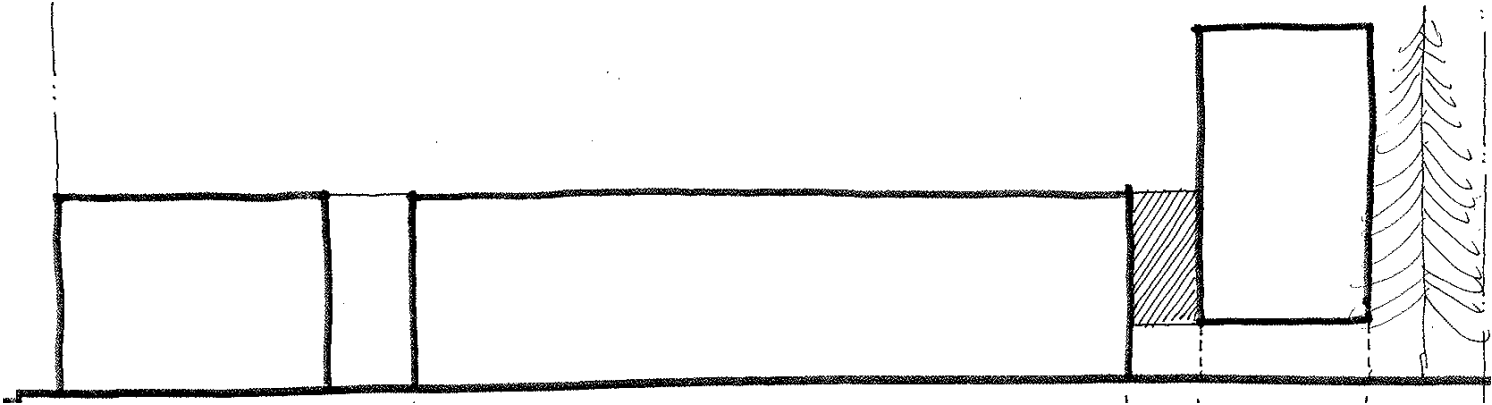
Bellevue Avenue E facade with bridge pulled back from street.
